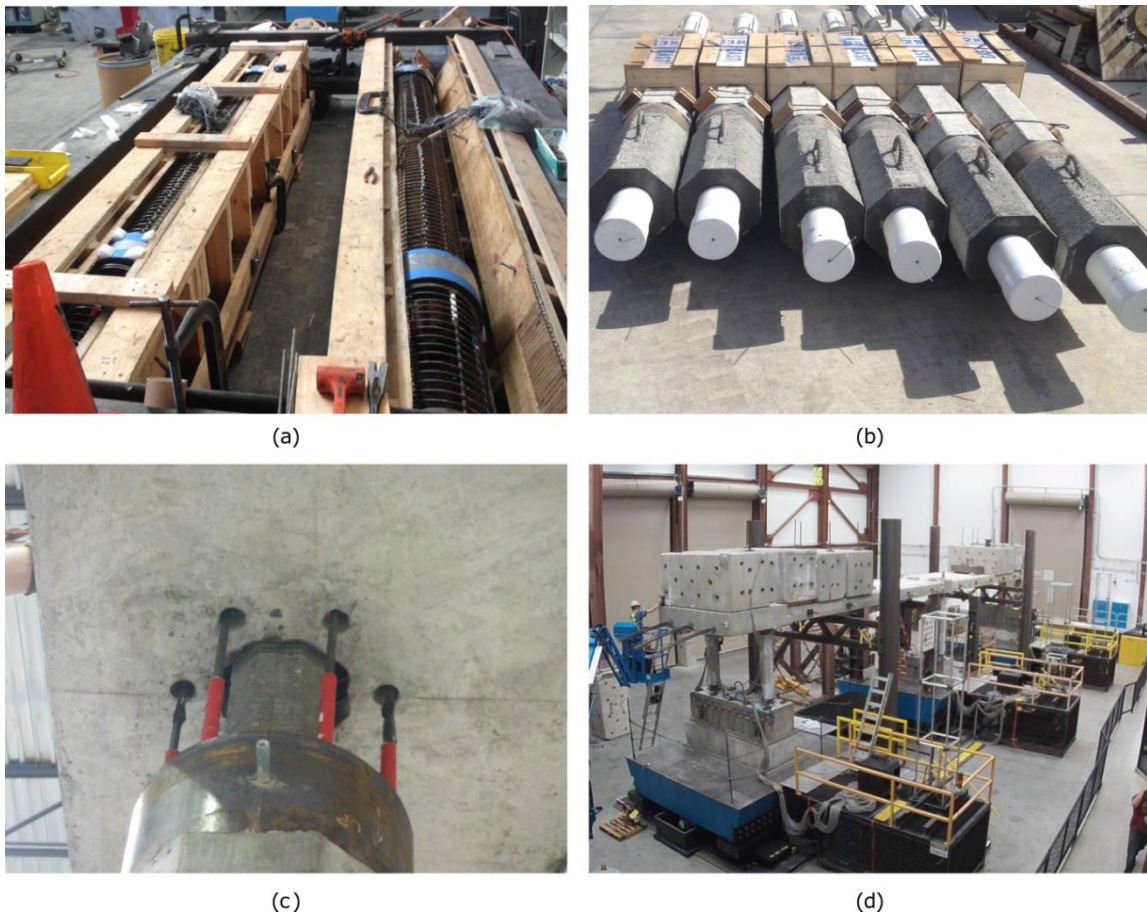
Construction photos. (a) column construction, (b) precast, pre-tensioned columns after arriving at UNR, (c) hybrid-bar-socket connection, (d) completed bridge prior to testing.
